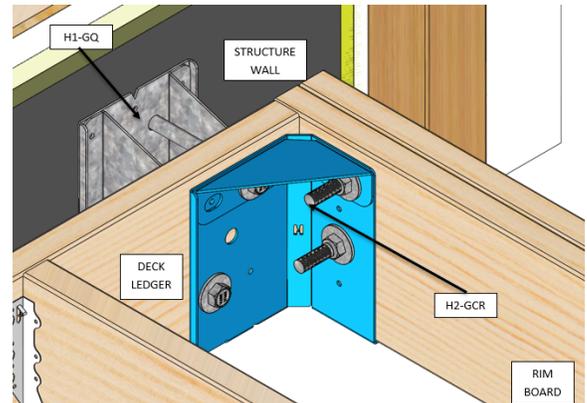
TYPICAL QUEEN BRACKET (H1-GQ) AND CORNER BRACKET (H2-GCR OR H2-GCL) INSTALLATION
